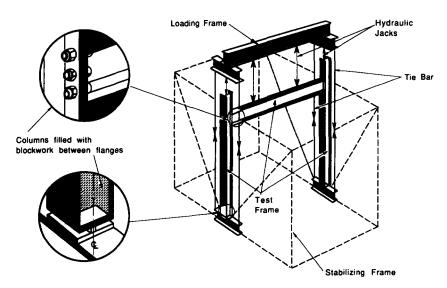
Schematic layout of the loaded frame used in the Cardington tests.
